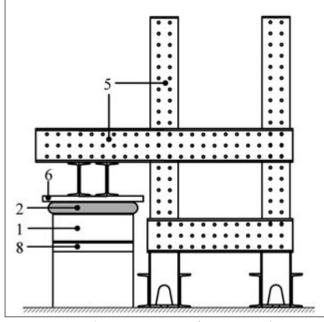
Side view of the test arrangement (1 – Porotherm floor specimen; 2 – pressure blanket; 5 – loading frame; 6 – counter formwork; 8 – support)
